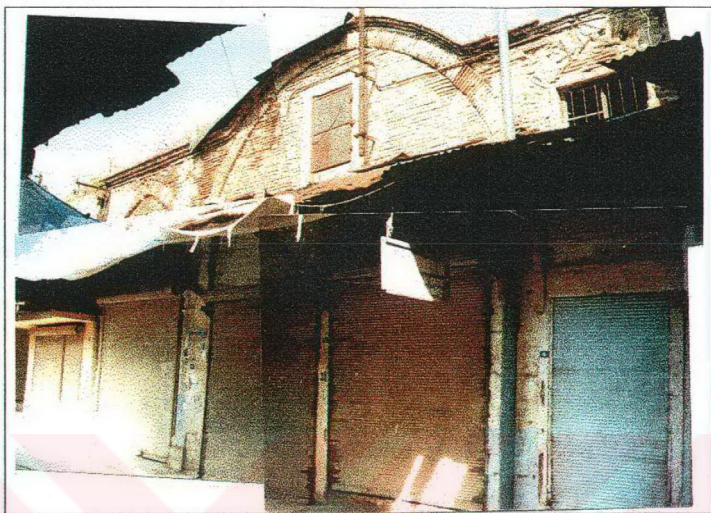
The facade of the building lot:94, door no:26-32(Akar T 2000)
